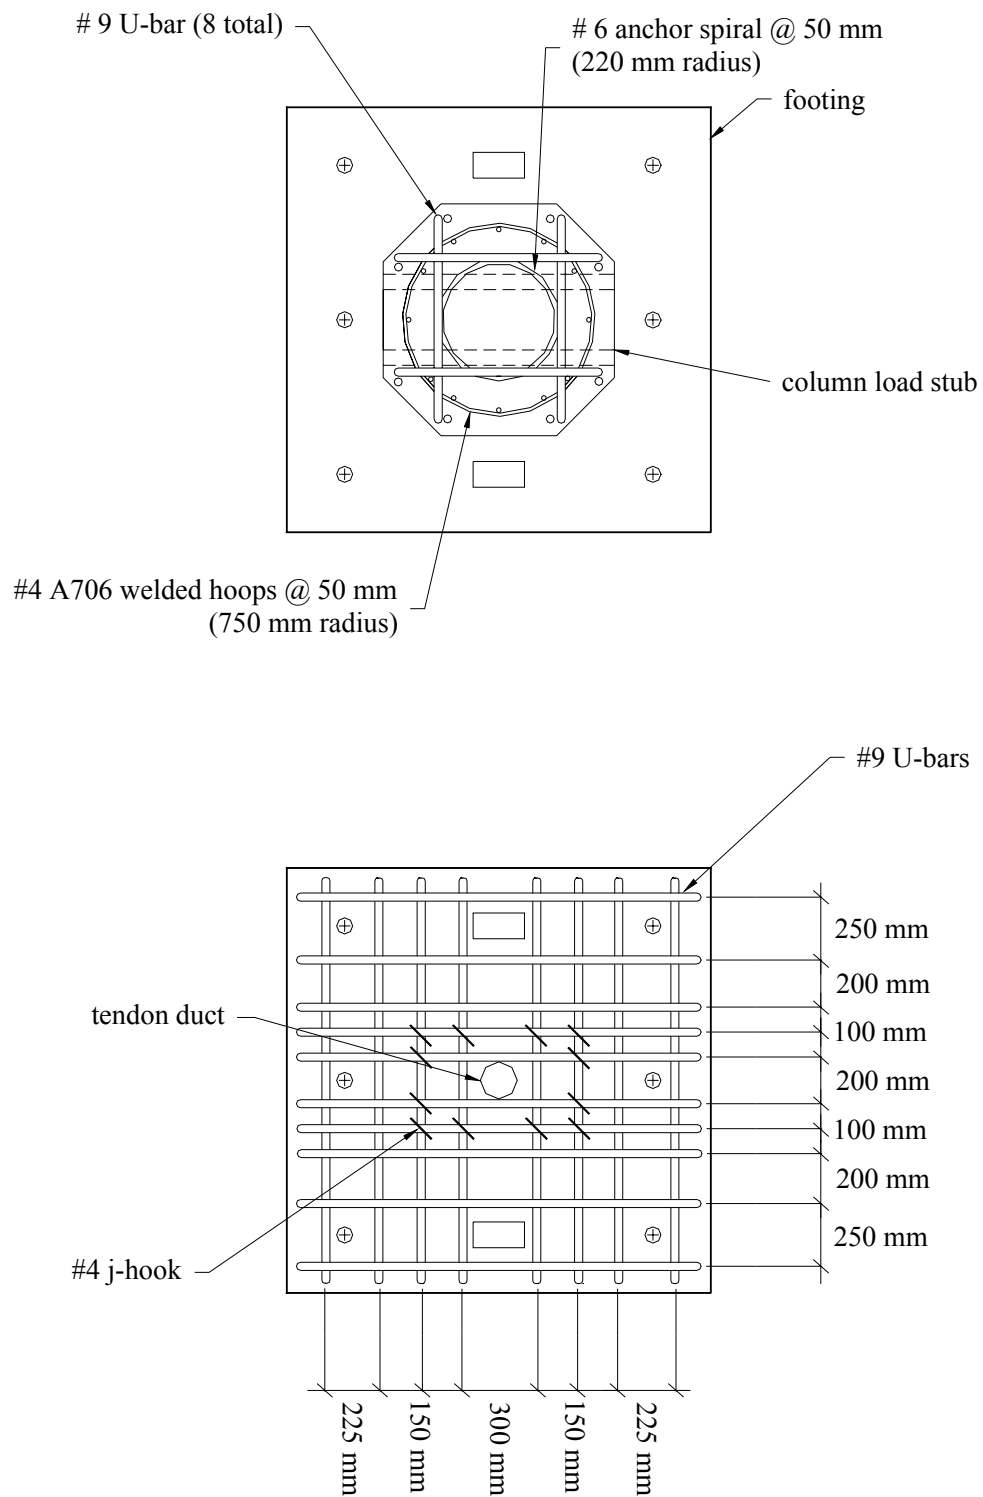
Specimen JH1 and JH2 footing and load stub reinforcement details
